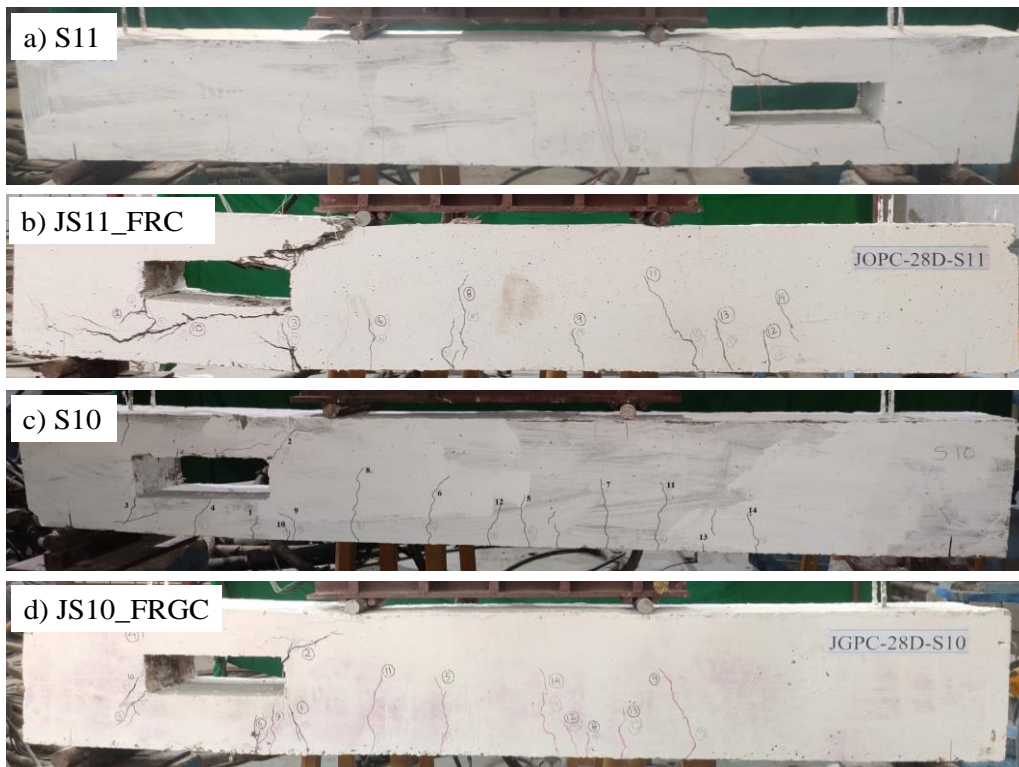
Crack patters of tested beam with shear-span opening (28th Day)
